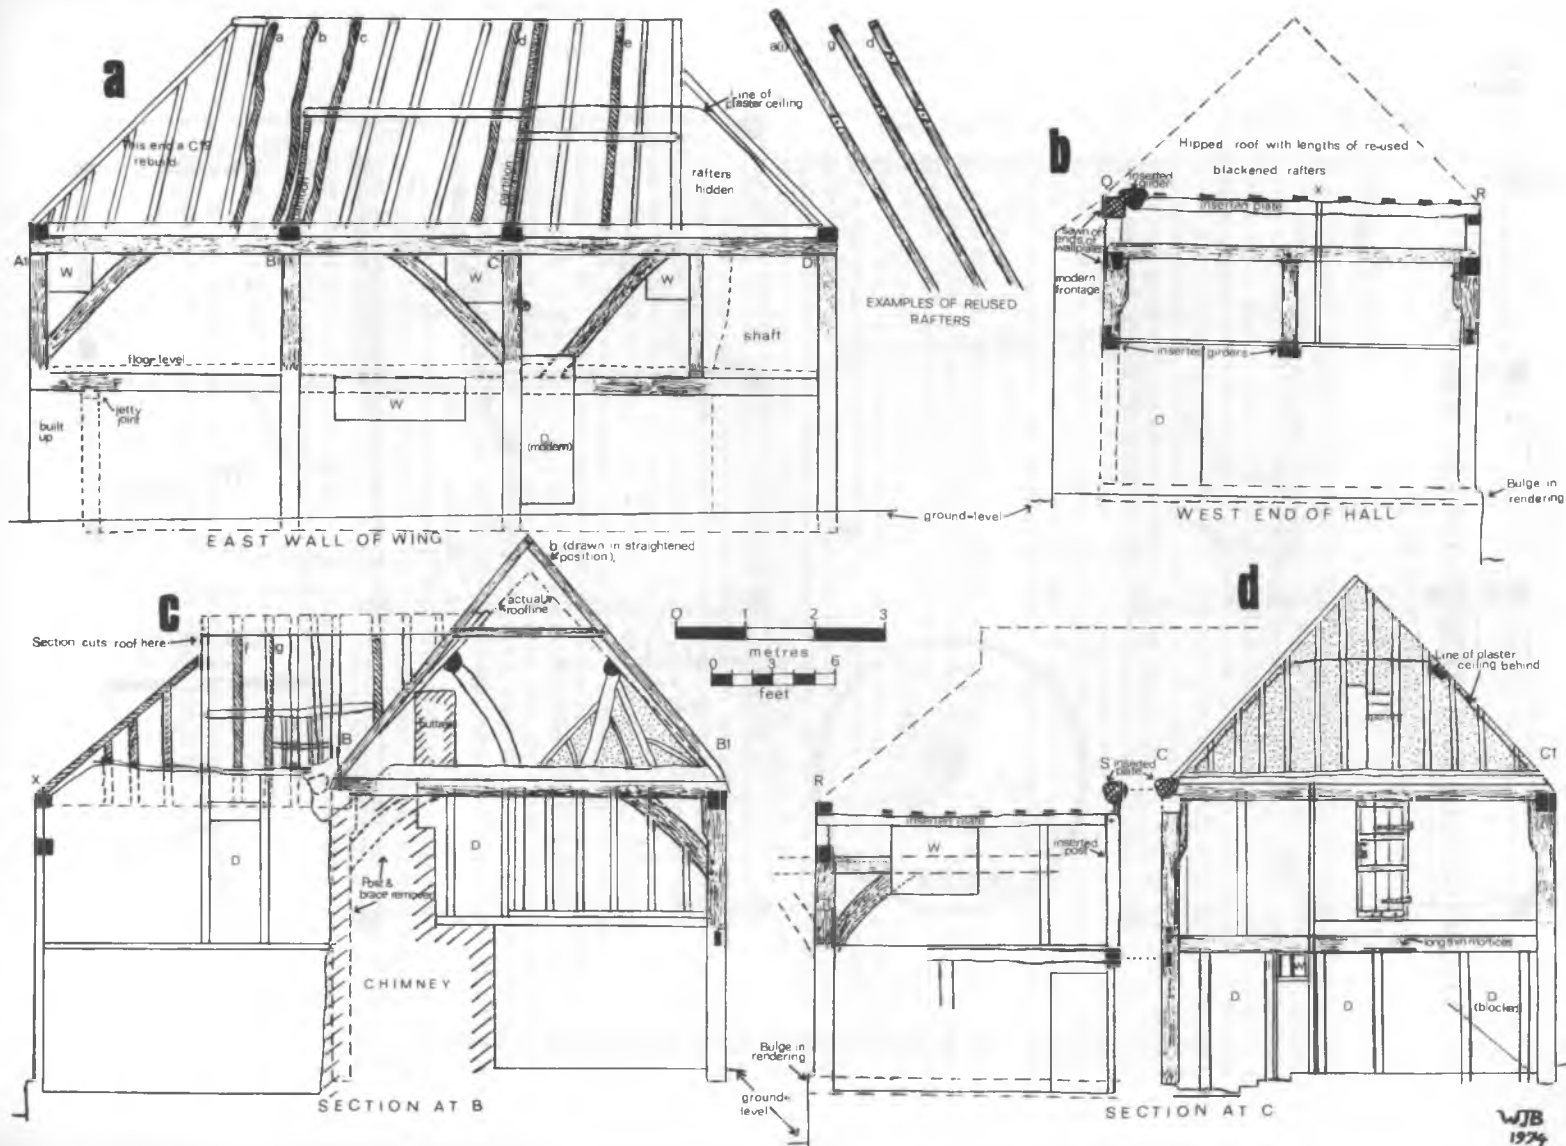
/35 HIGH STREET, LEATHERHEAD : ELEVATIONS AND SECTIONS
